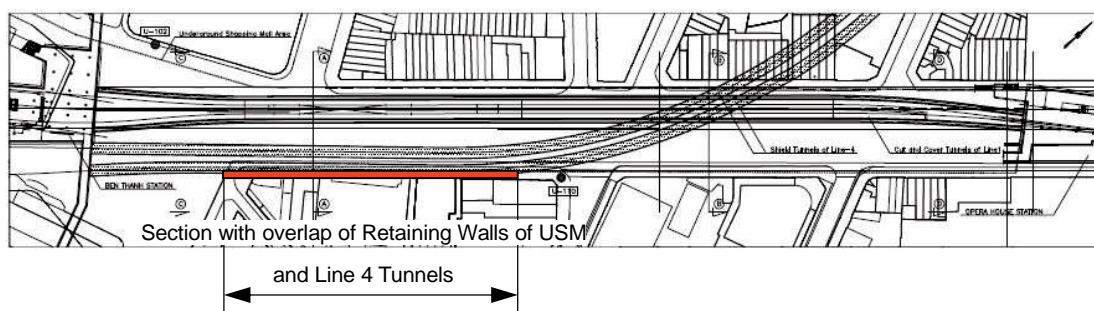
Section with Overlap of Retaining Walls of USM and Line 4 Tunnels
